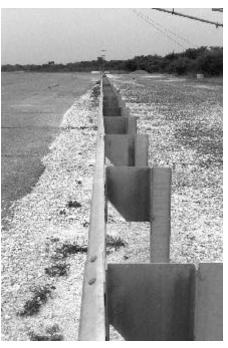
Modified three beam guardrail installation prior to test 404211-5.
